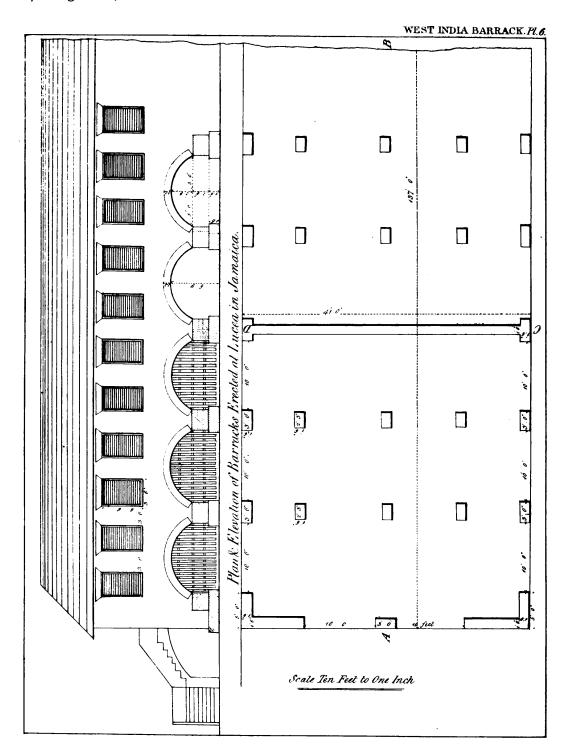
Plate 6 (Plan & Elevation of Barracks Erected at Lucea in Jamaica)
